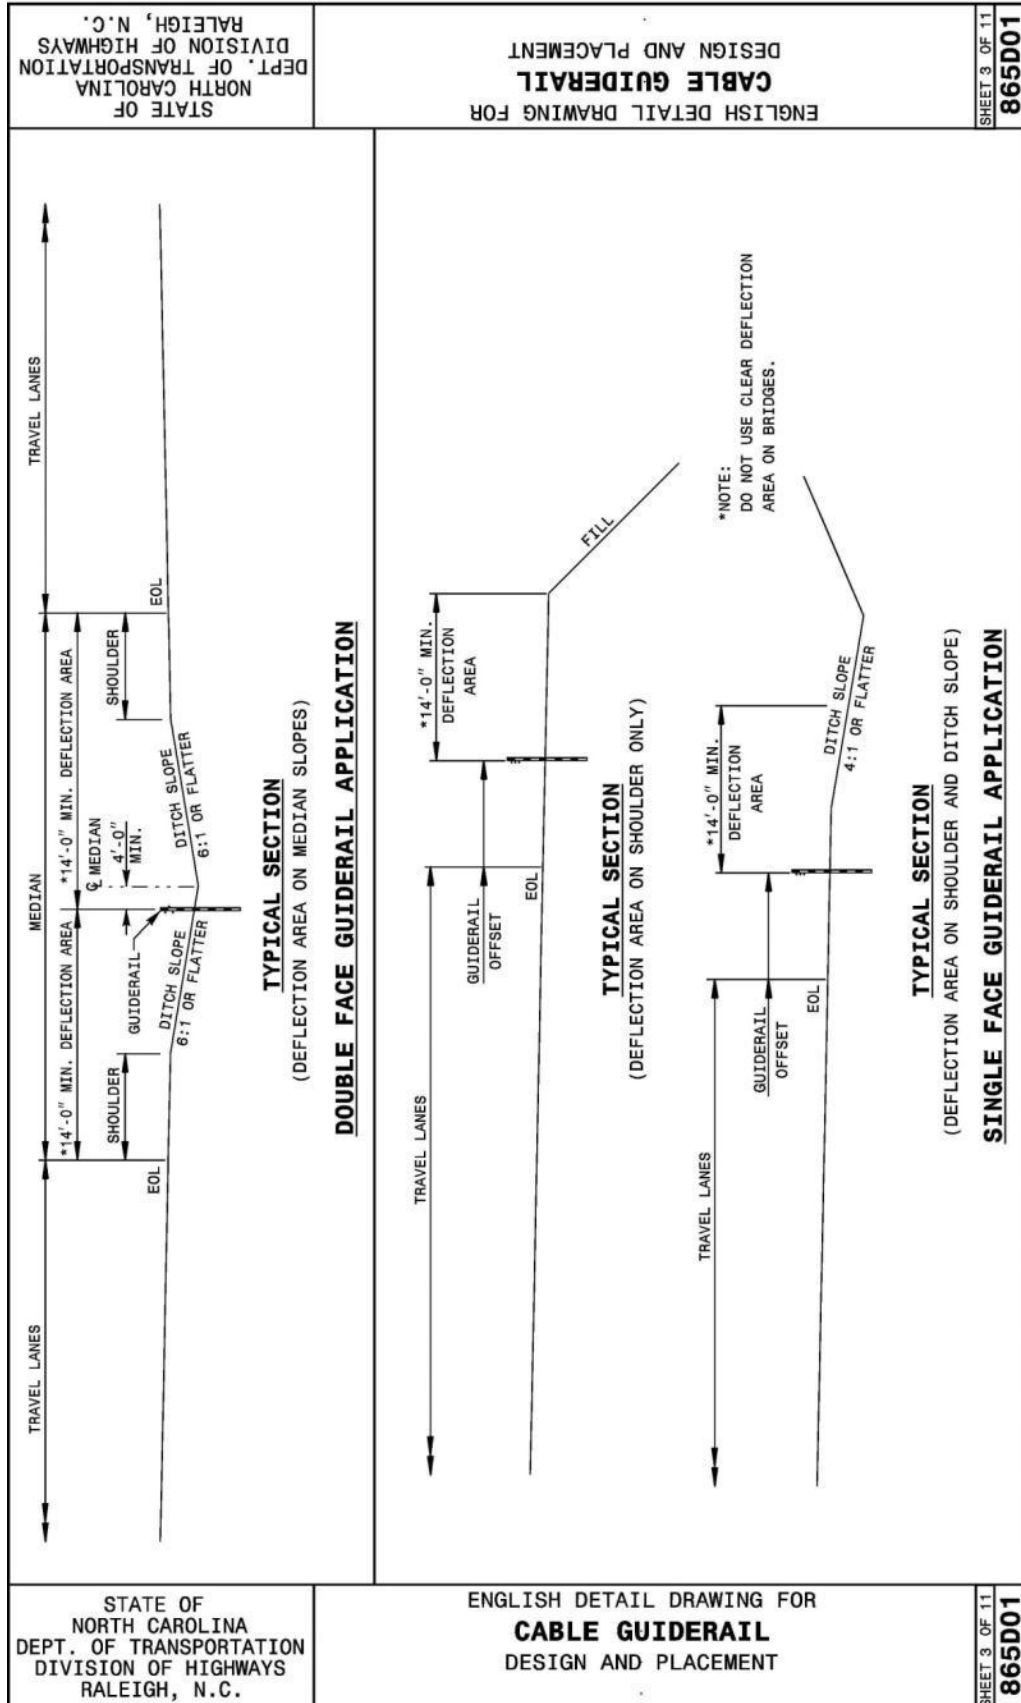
Low-Tension 3-Cable Median Barrier Standard Plans, North Carolina DOT, 2002
